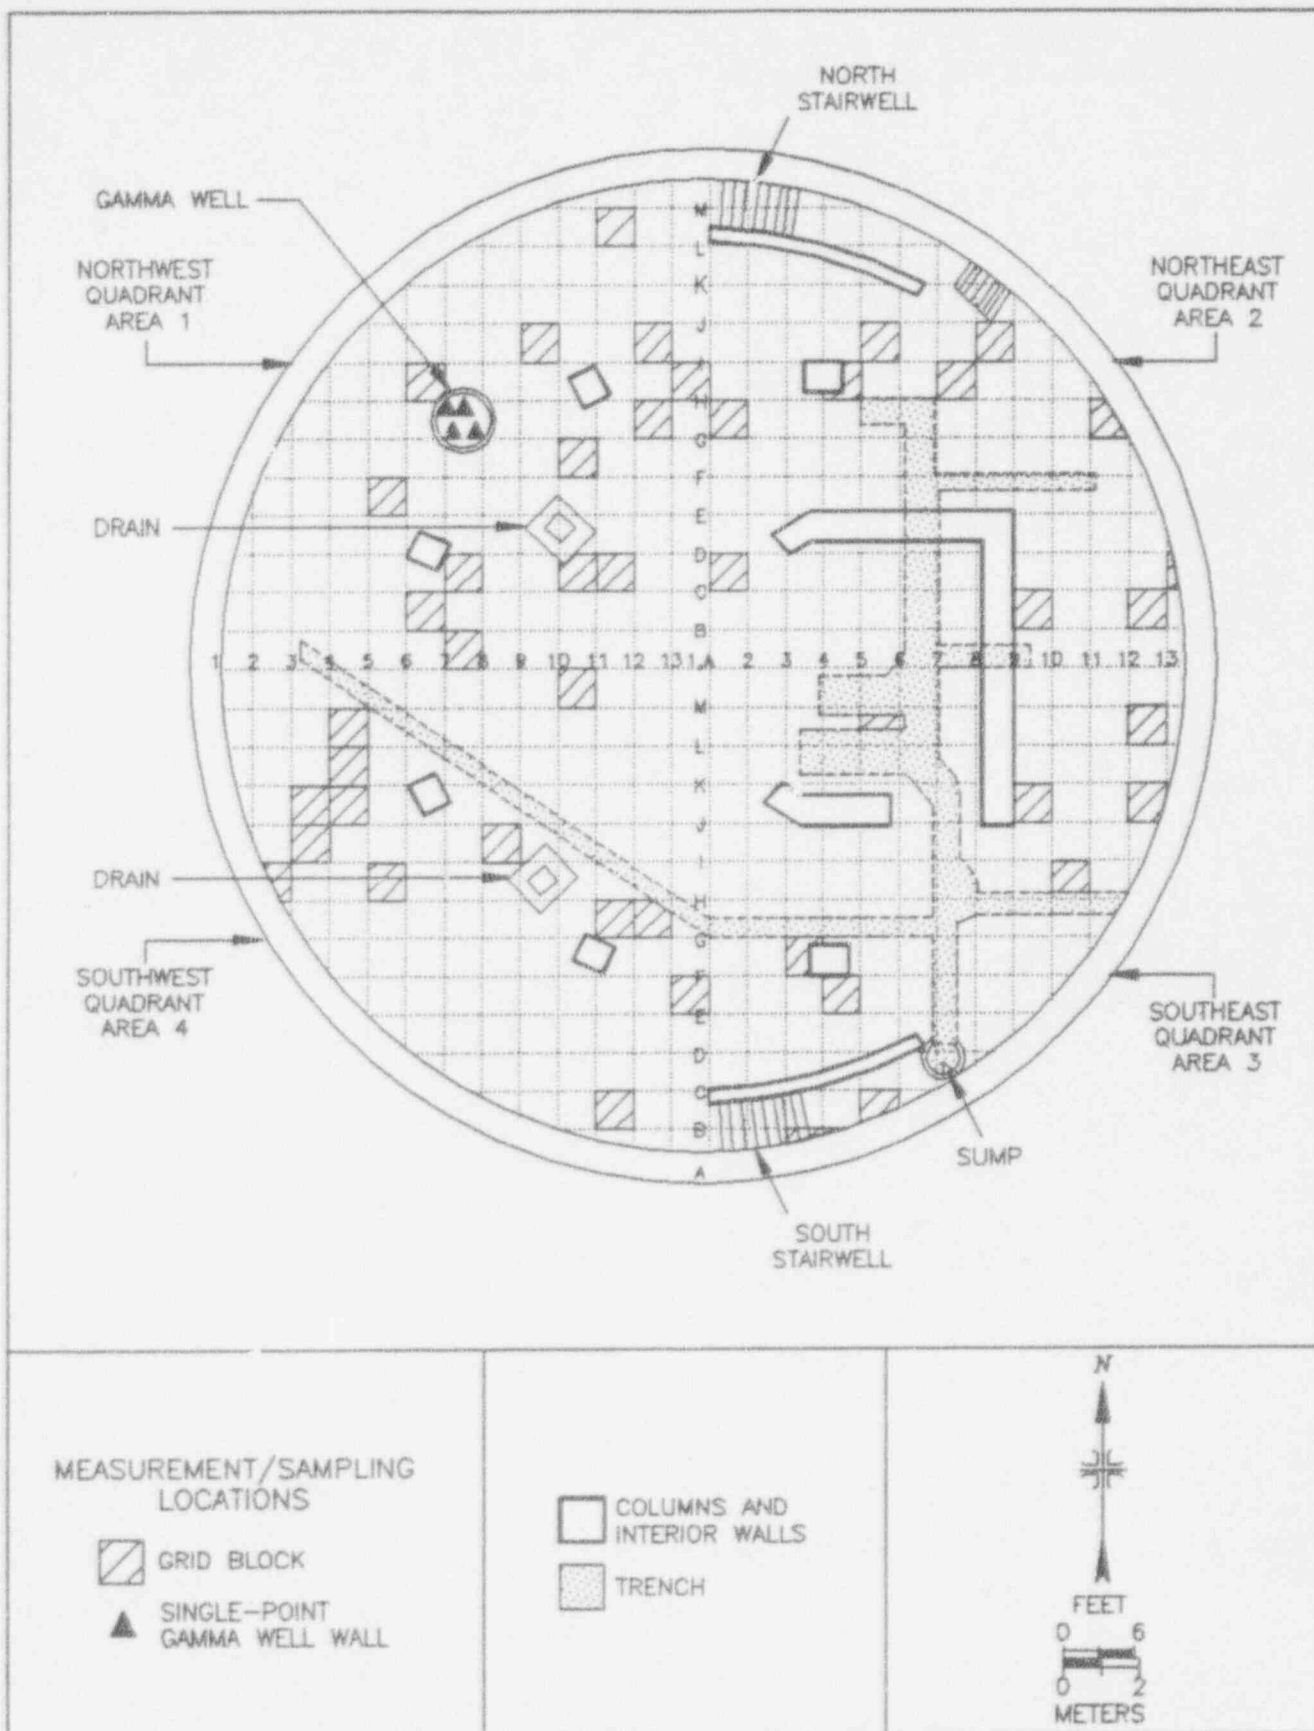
Building 100, Basement Level Floor -- Reference Grid and Measurement and Sampling Locations
